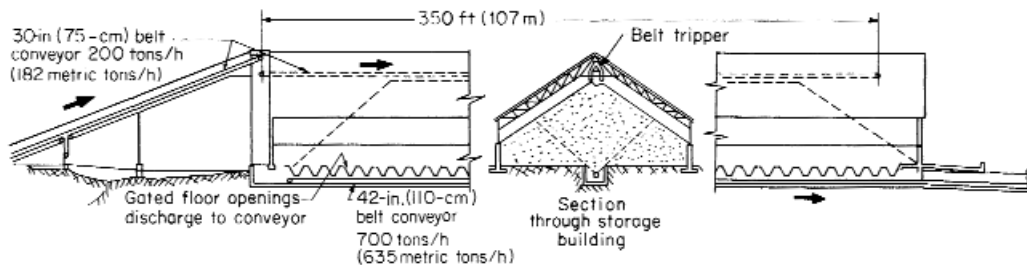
Belt-conveyor storage and reclaiming in a flat-floor building. (Stephens-Adamson Division, Allis-Chalmers Corporation.)
